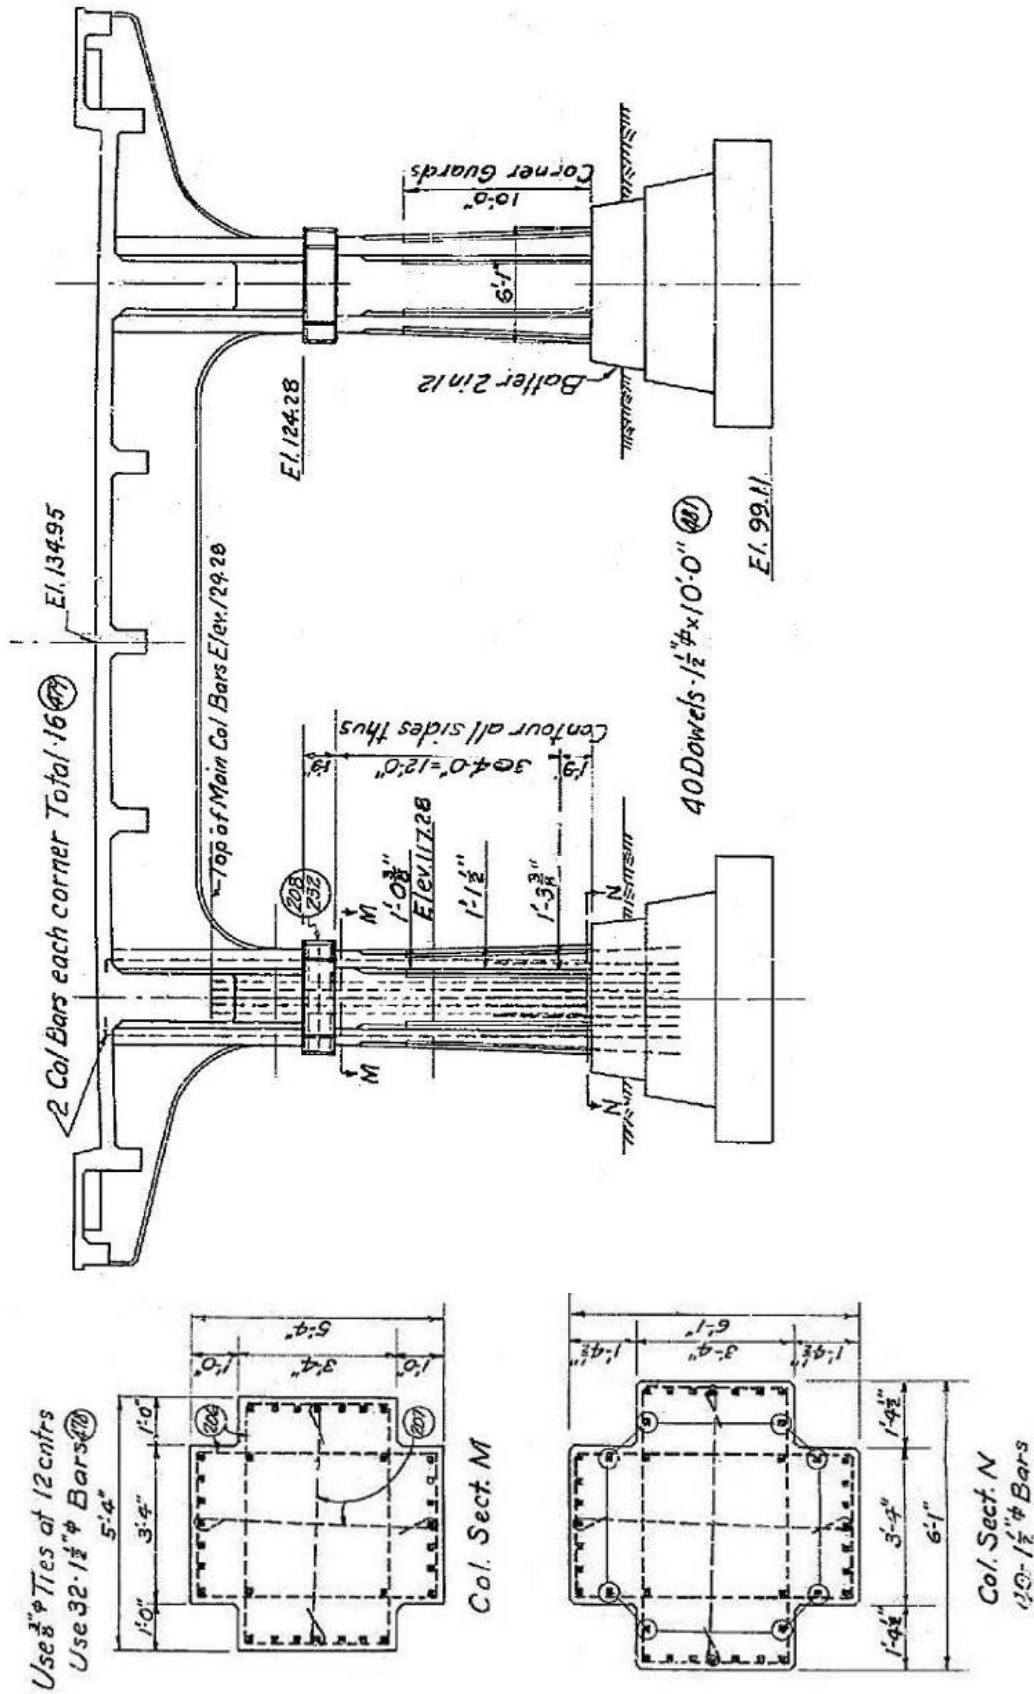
Column As-Built Details (1 in. = 25.4 mm)
